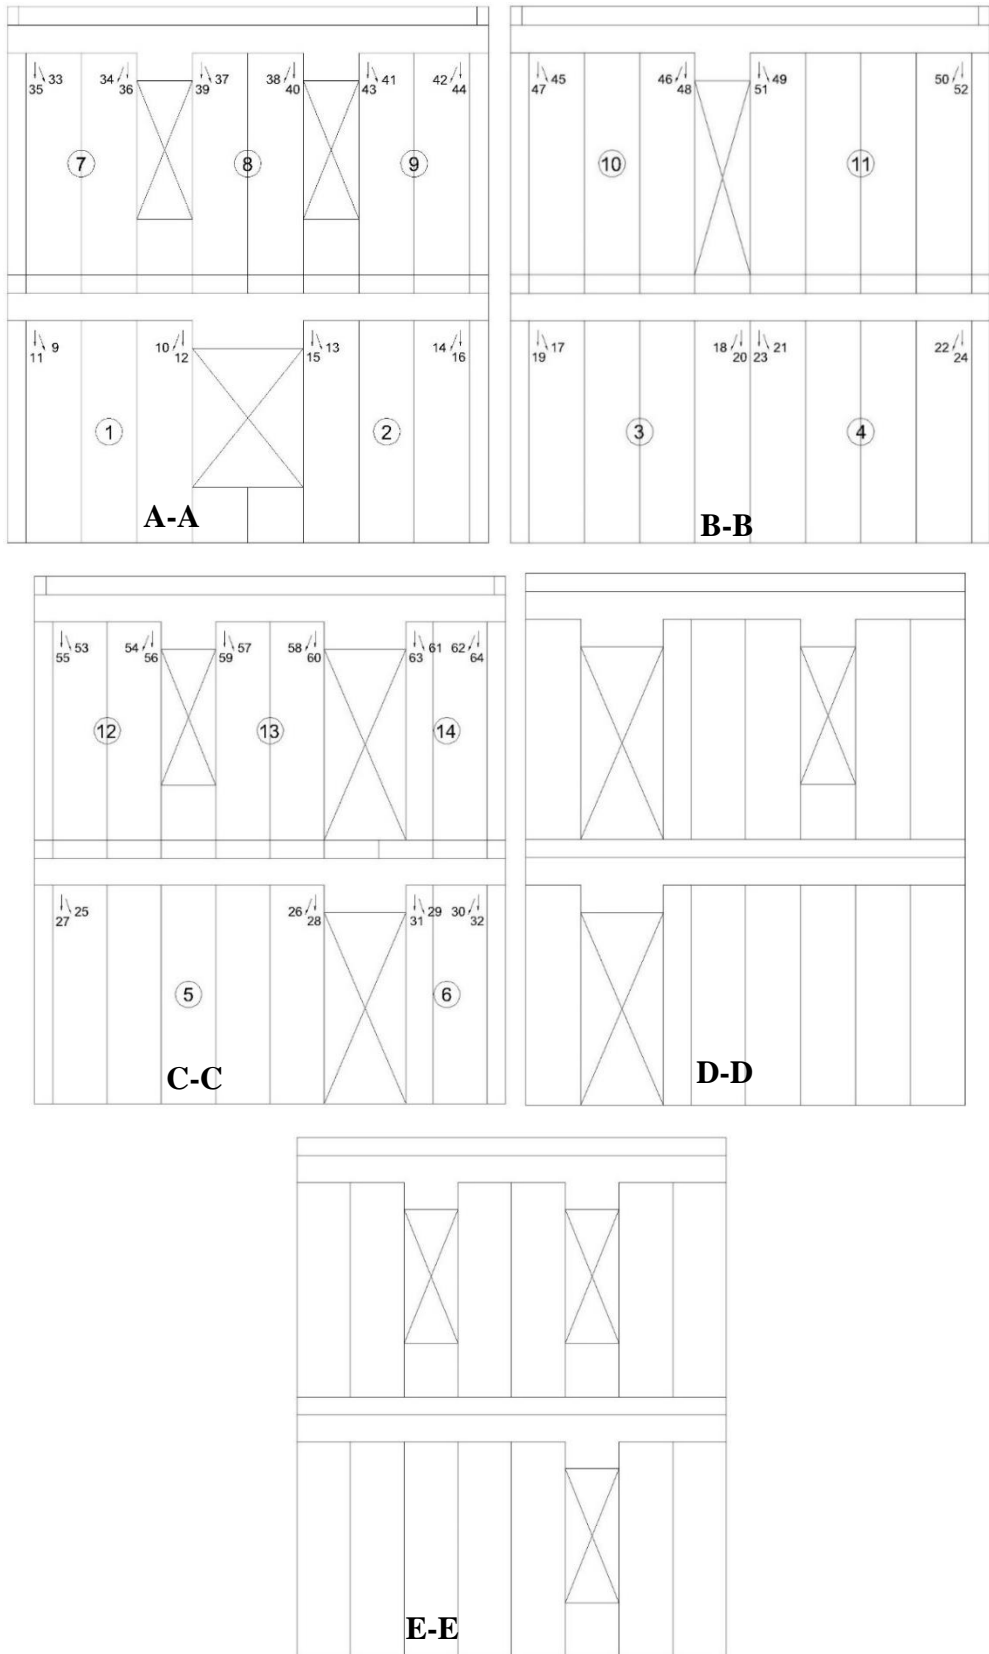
Section Views of the Walls & Deformation Measurement Locations
